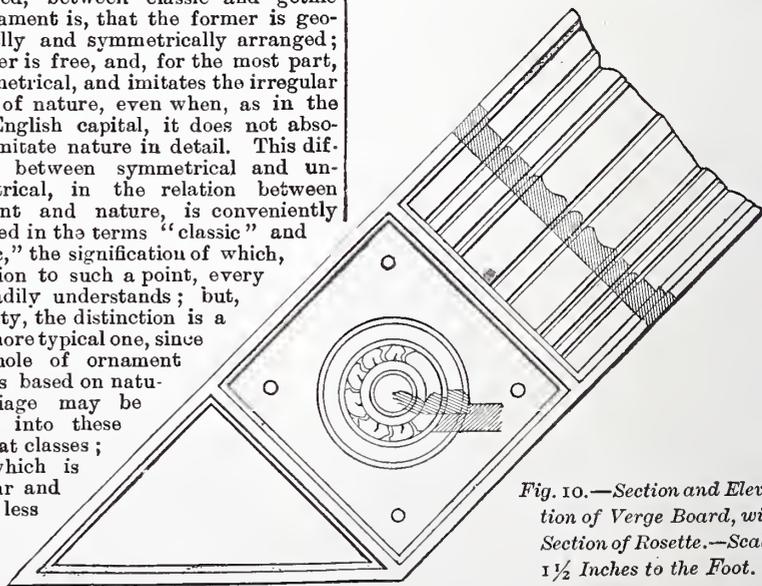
Section and Elevation of Verge Board, with Section of Rosette.—Scale, 1 1/2 Inches to the Foot.
